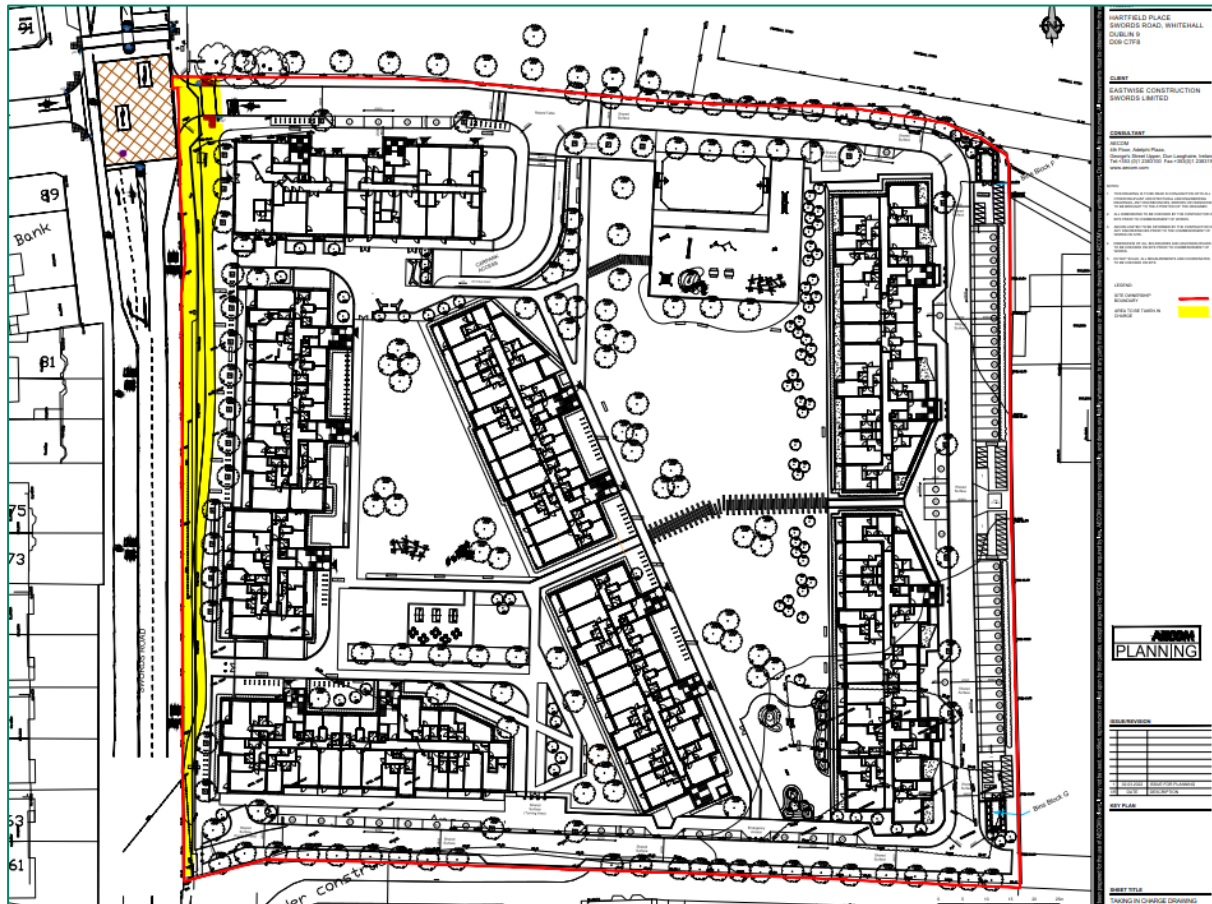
Taken in Charge drawing (AECOM drawing no. PR379360-ACM-XX-XX-DR-CE-20-0003)
